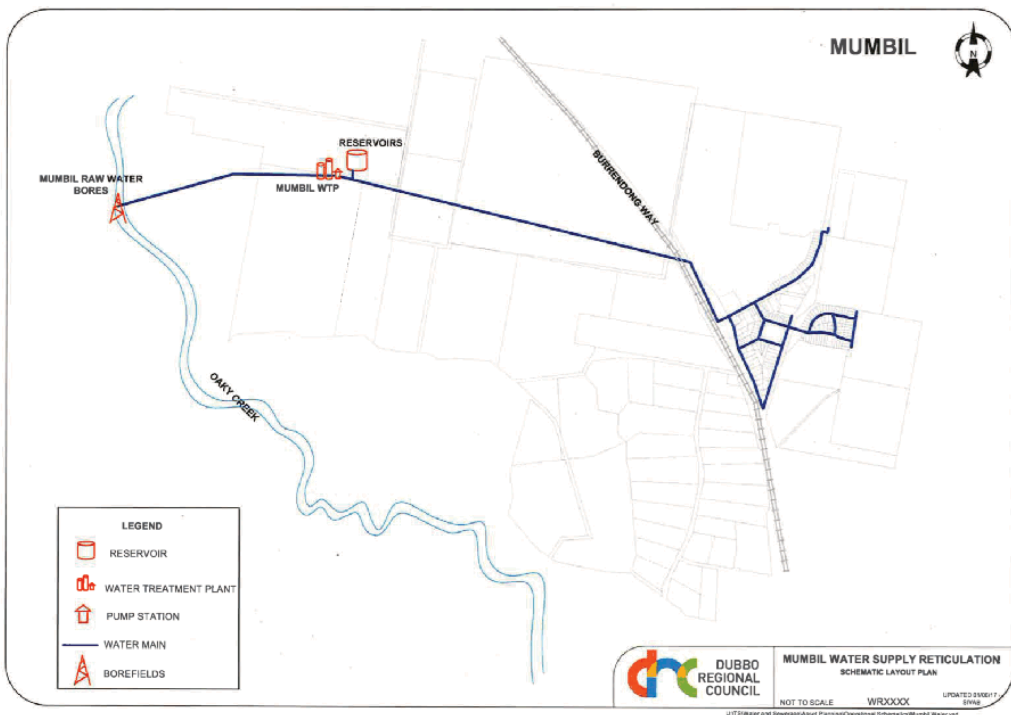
MUMBIL WATER SUPPLY RETICULATION SCHEMATIC LAYOUT PLAN
